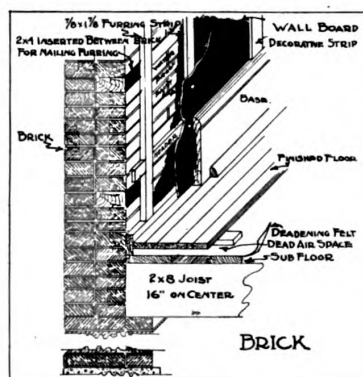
Wallboard used in a brick-walled building. Pieces of 2x4, the length of a brick, are built into the wall and afford nailing base for the furring strips. Another way to get a good nailing base is to insert a wood strip, the thickness of the mortar joint, between the bricks. The wall should be waterproofed before applying wallboard.
